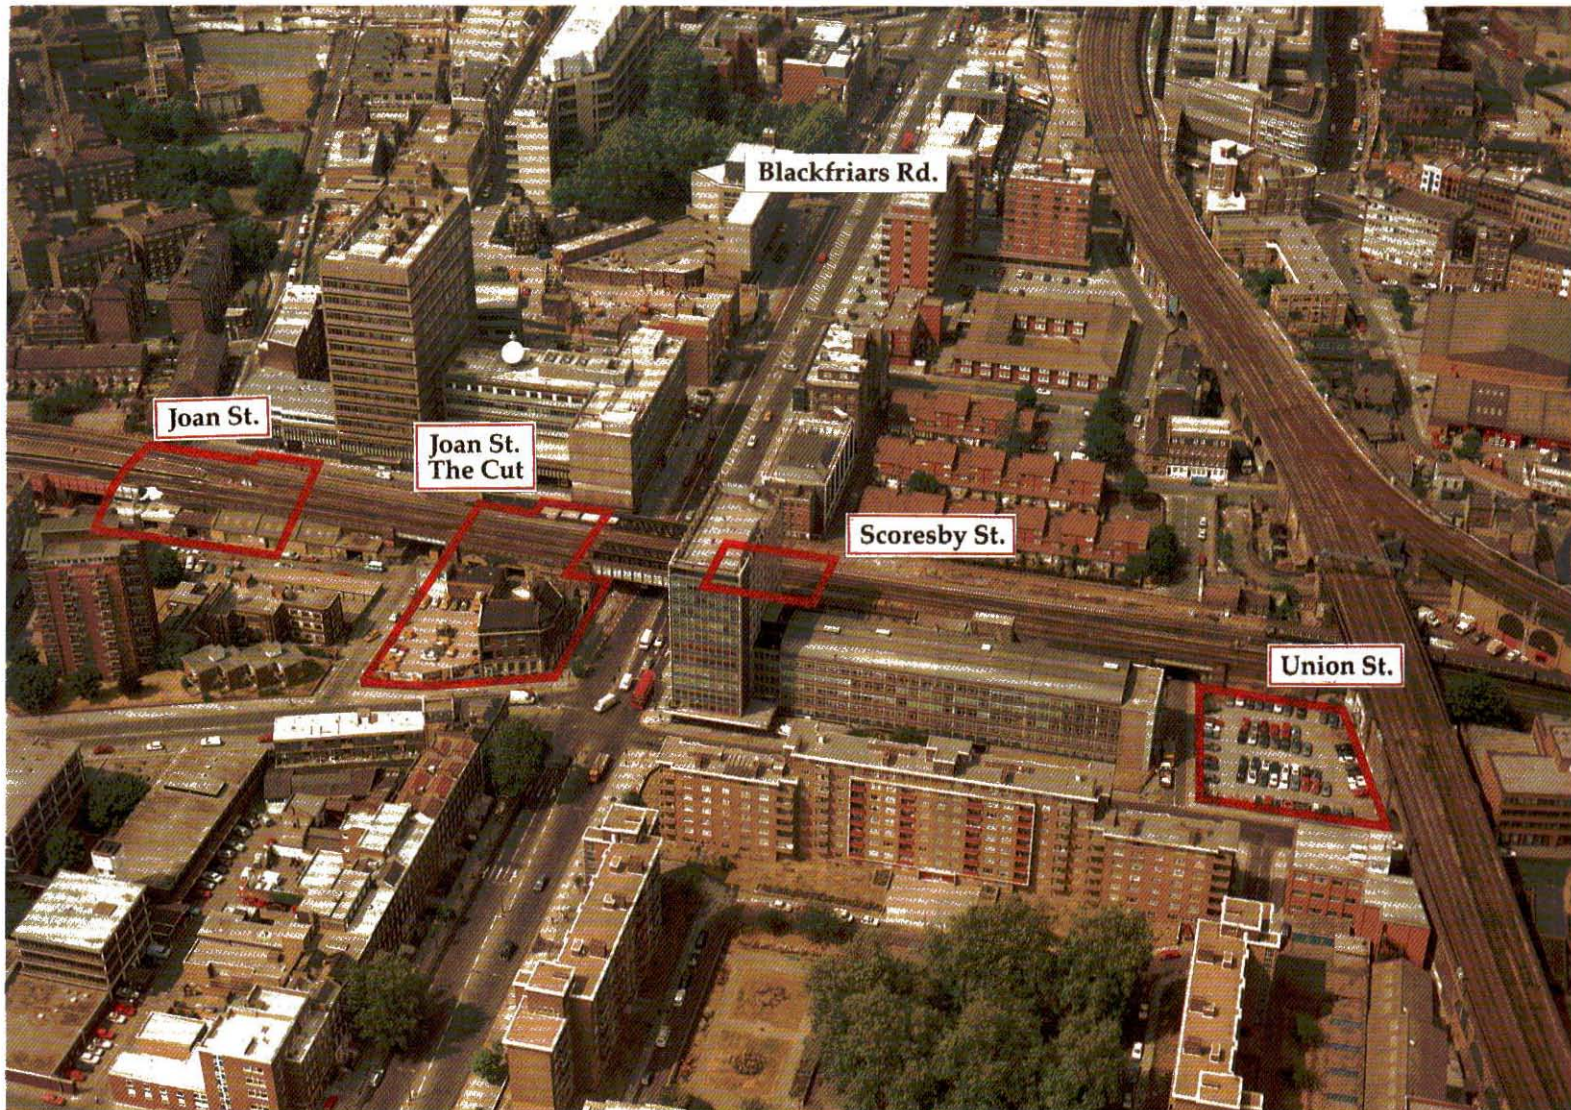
(c) Southwark Station and Ewer Street Work Sites
